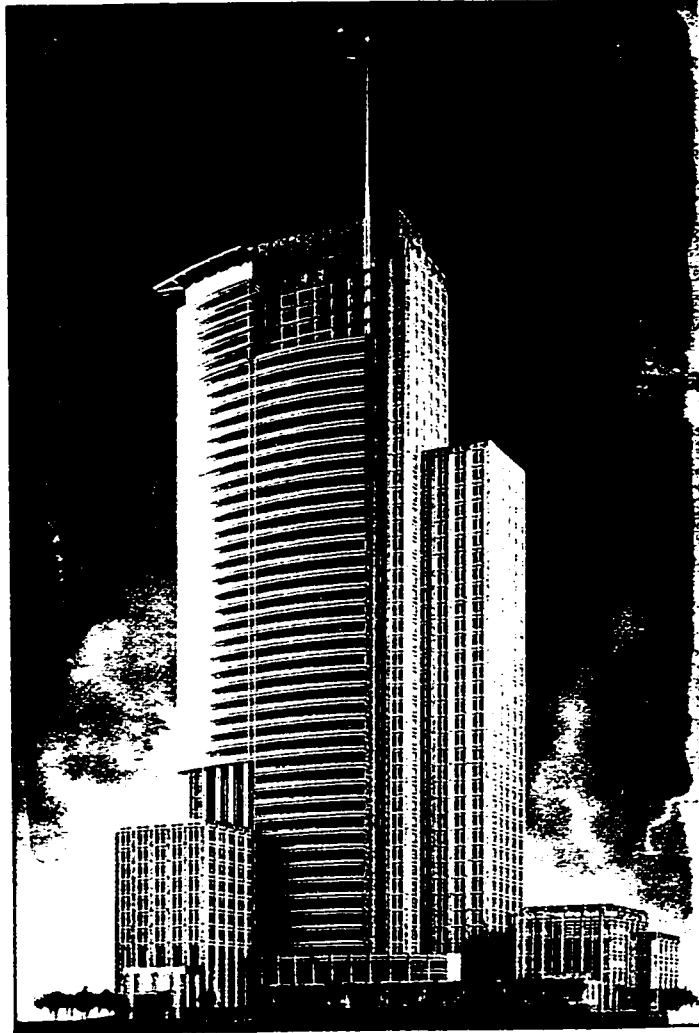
Elevation of Design Case 2: IBM-Marathon building, Montreal (BOMA 1992).
